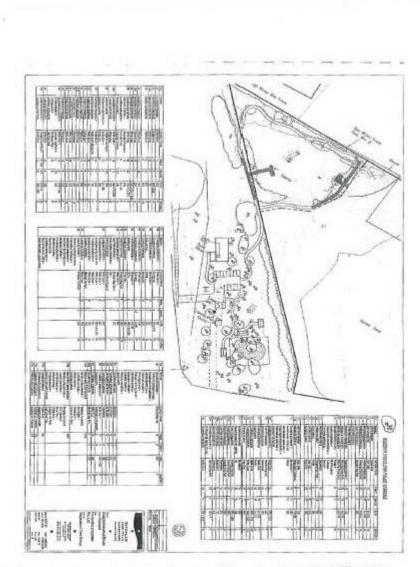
Draft Landscape Plan for proposed Upgrade and extension of Teamsters
